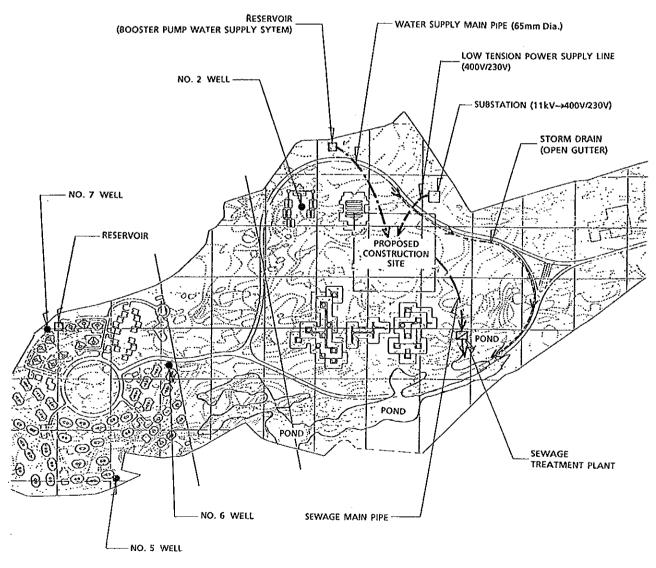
Infrastructure Around the Proposed Construction Site
